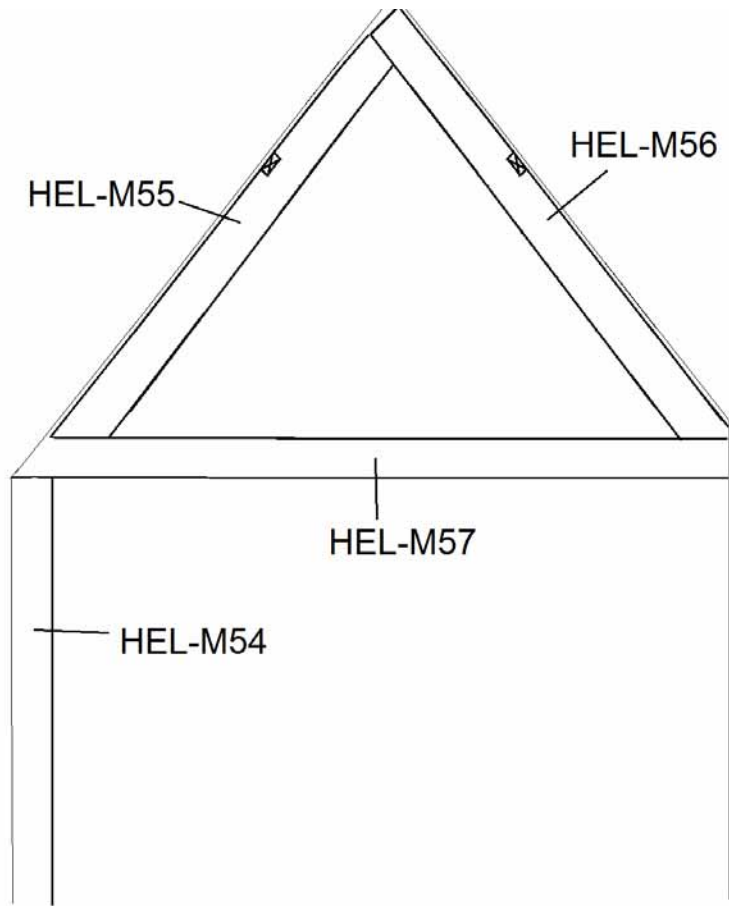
South-west wing, sketch of truss, showing the location of samples HEL-M54–7
